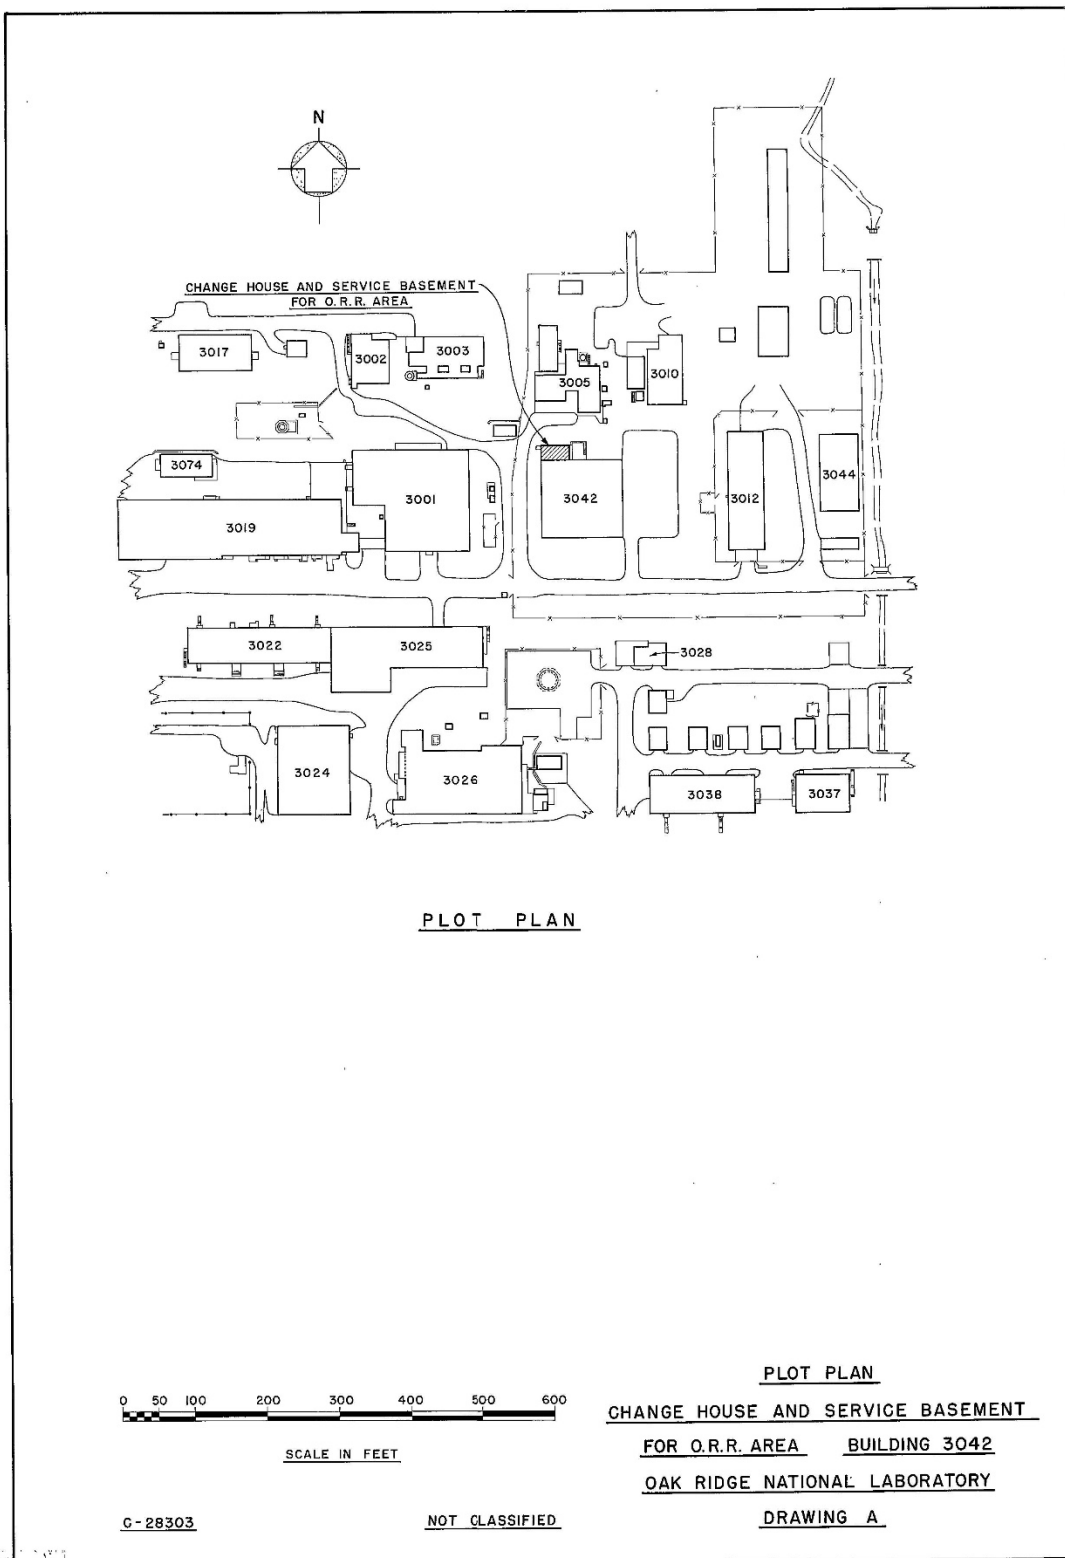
Plot plan pertaining to the construction of the circa 1957 Change House and Service Basement on the north elevation of Building 3042 (Oak Ridge National Laboratory, n.d.).
